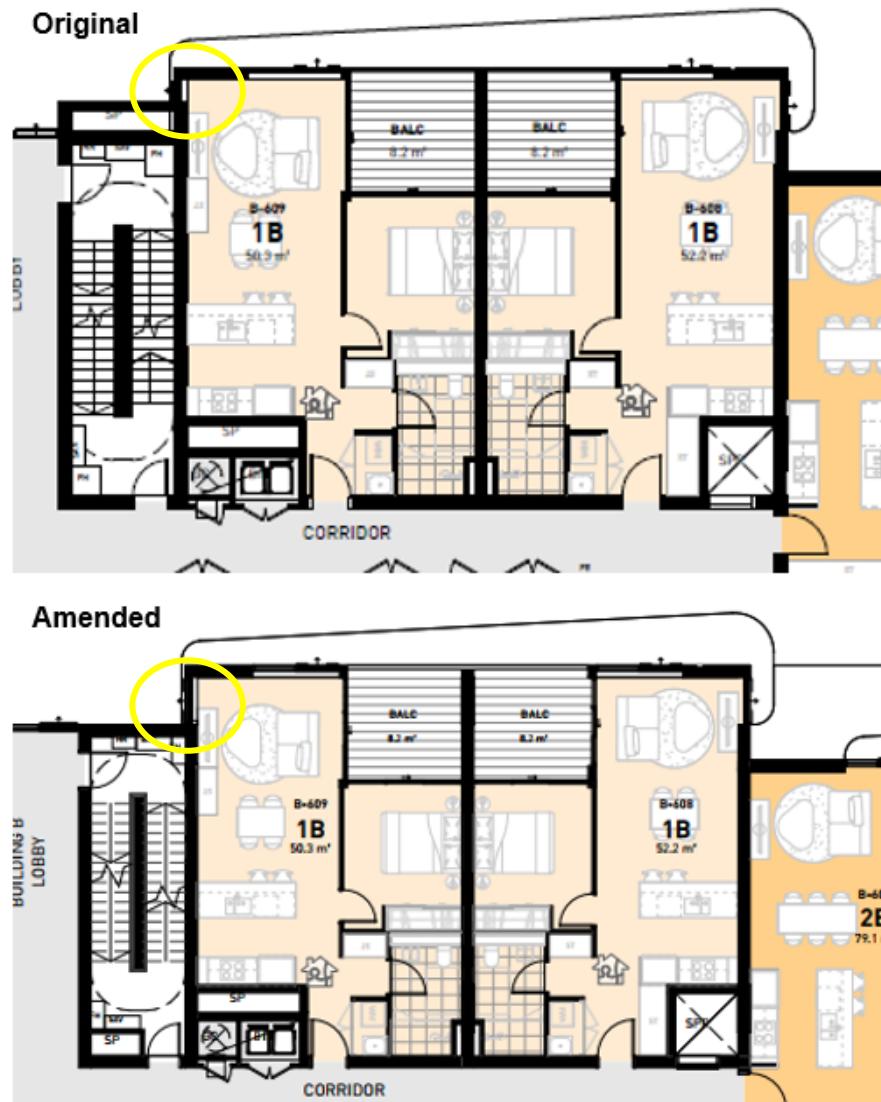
Original (top) and proposed amended (bottom) typical Units B-08/09, Building B (Source: PTW Architects)
